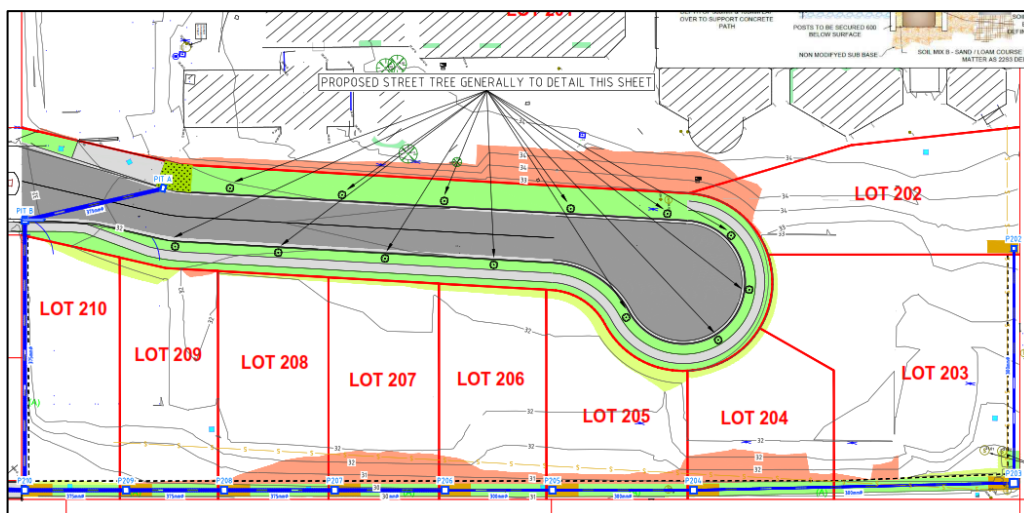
Proposed Street tree landscaping (Sheet 17 of the concept engineering plans)
